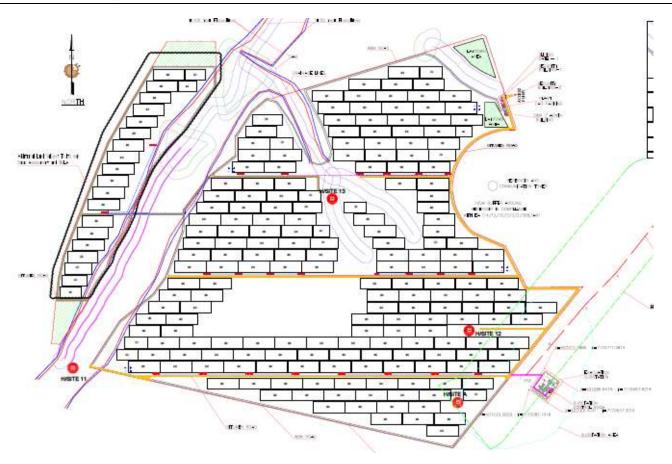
Excerpt of Site Development Plan (Sun Edison, 2016)
